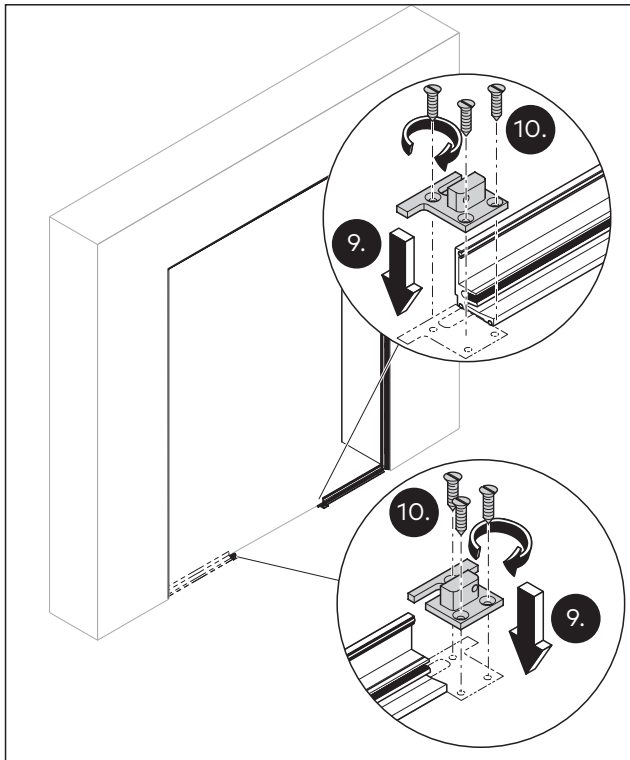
Example of attaching the door frame positioner to a mounting profile from the viewpoint of the hinge side
